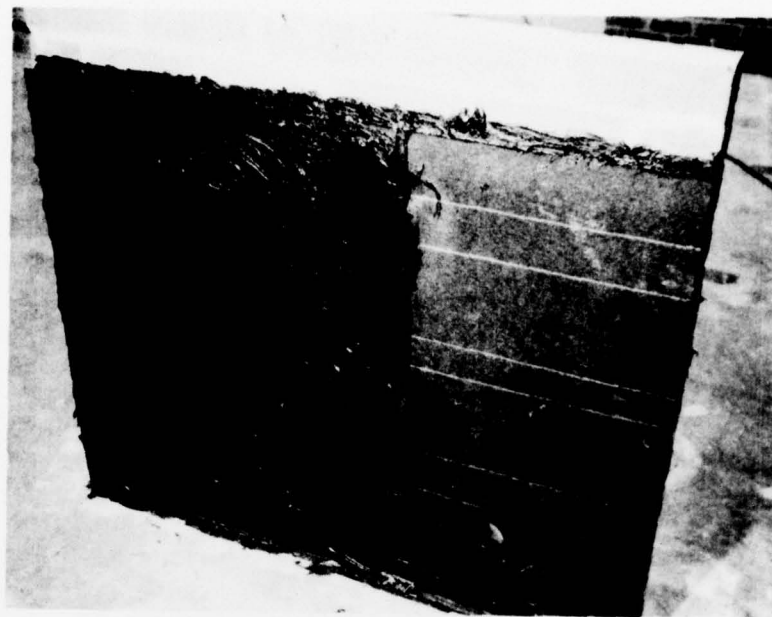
Water barrier composed of asphalt cement, roofing felt, and more asphalt cement
